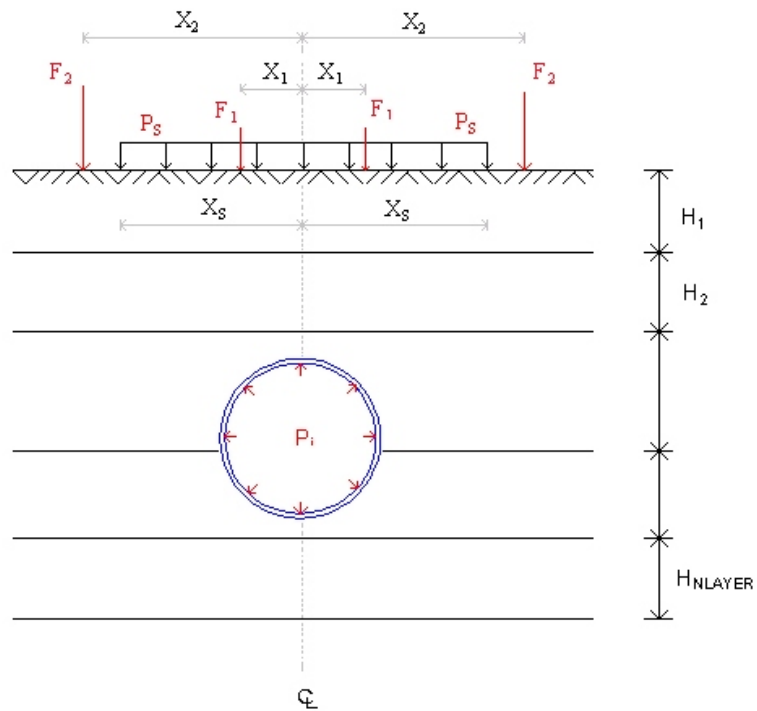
Schematic Tunnel Section in the Layered Medium
